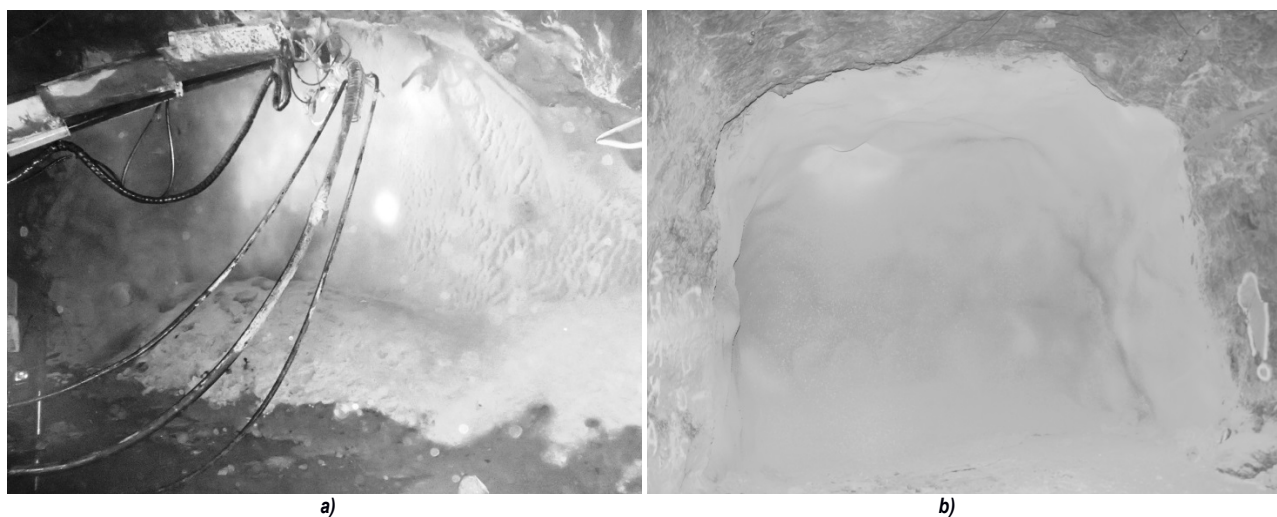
a) Barricade in the process of sprinkling with shotcrete; b) Completed barricade
